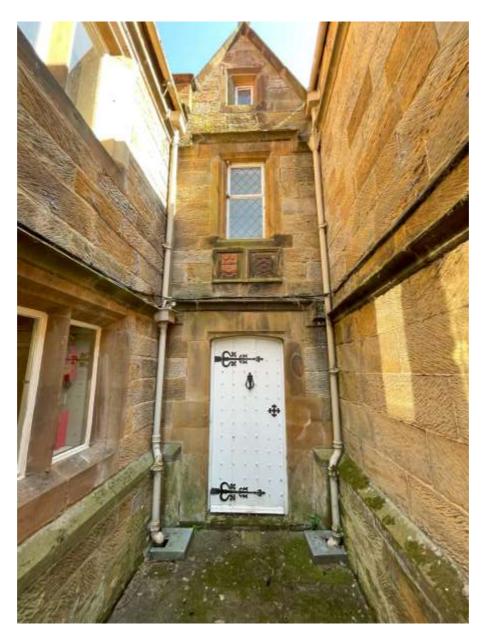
Northwest elevation of 'Link' building. Downpipes to both sides to be replaced with new. Guttering over to be replaced with new profile. Gulley's and underground drainage to be renewed.
